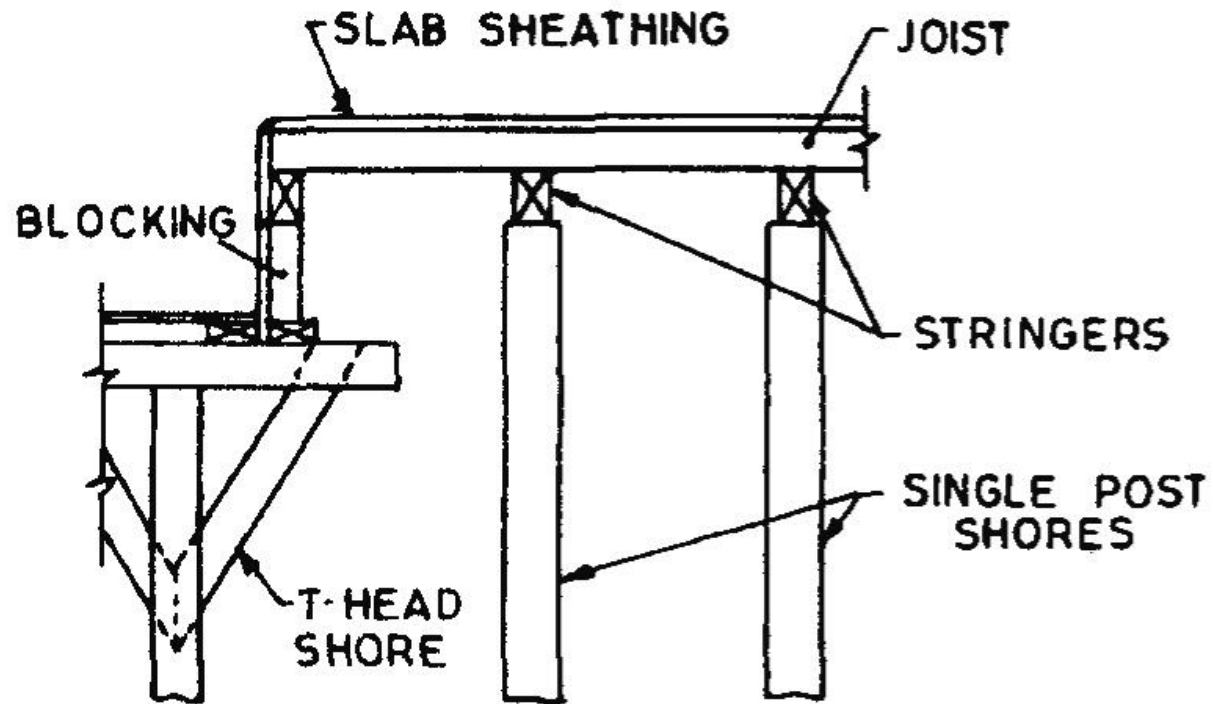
TYPICAL SLAB FORM RESTING ON BEAM LEDGER AND STRINGERS
